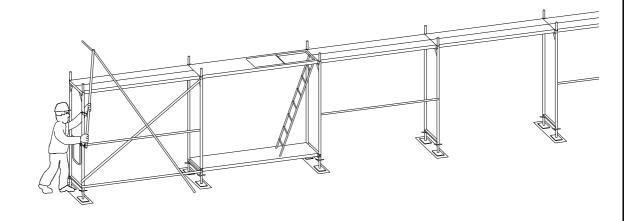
Mounting an advanced guardrail post with end guardrail and telescopic guardrail
